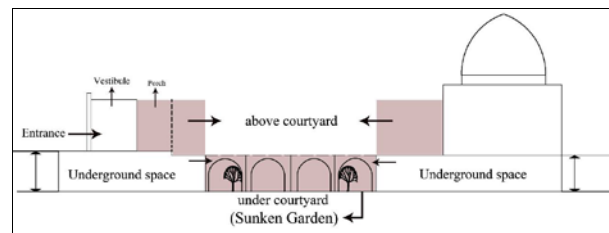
CONCEPT OF SUNKEN GARDEN IN DESIGN OF UNDERGROUND SPACES AS AN ECO-FRIENDLY BUILDING.
